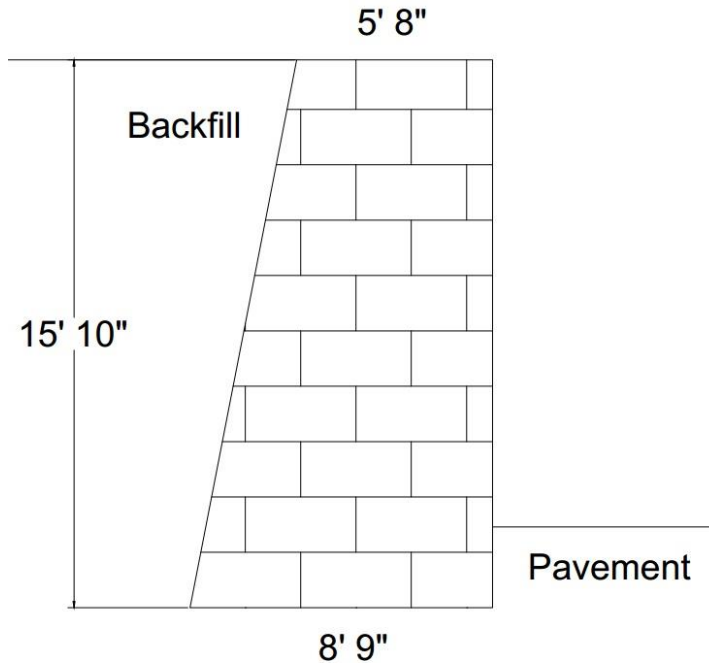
Diagram of masonry walls at Upland Avenue below the Upland (15 ft.) instrumentation location. Diagram is courtesy of Steve Chrismer of Amtrak.
